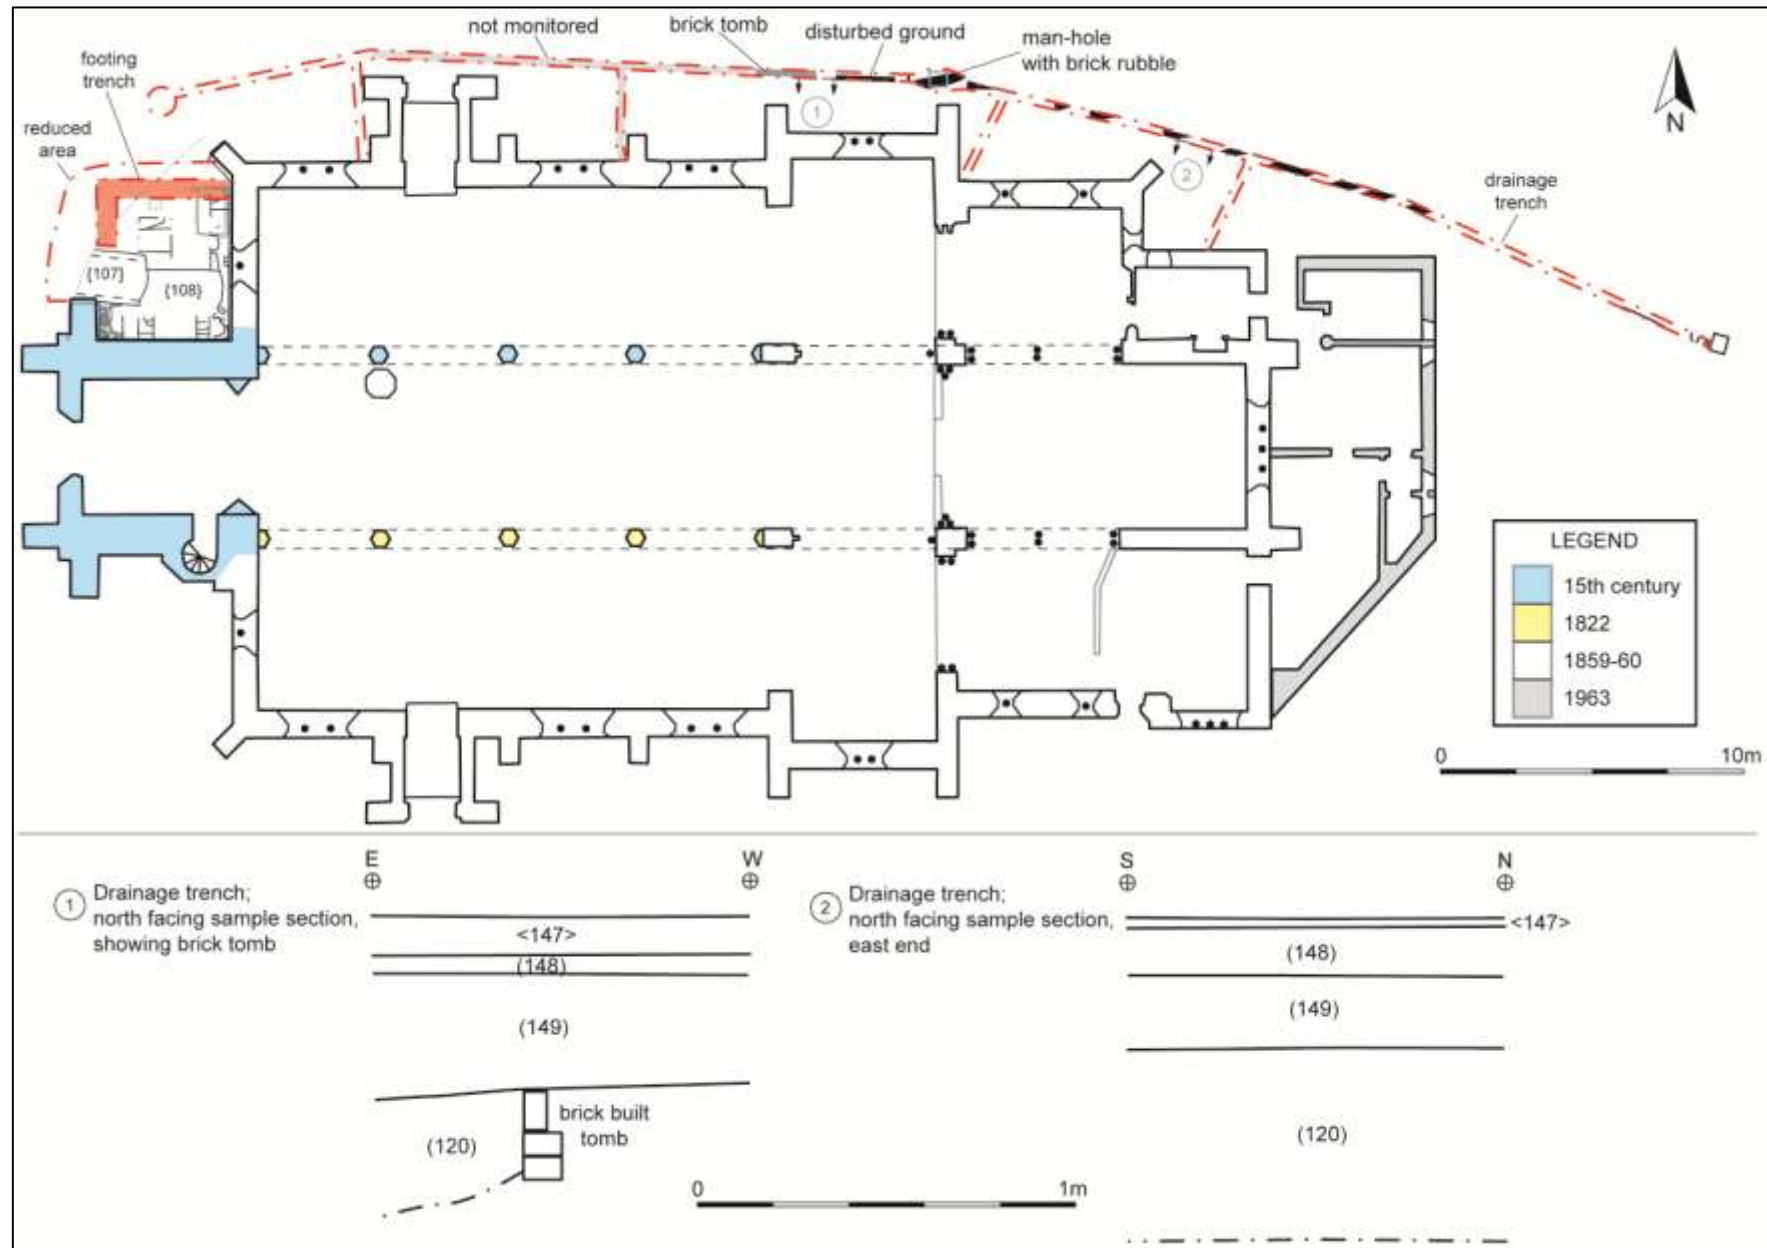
Site plan; showing location of drainage trench with sample sections and located features/grave-cuts, footing trench and reduced area.
